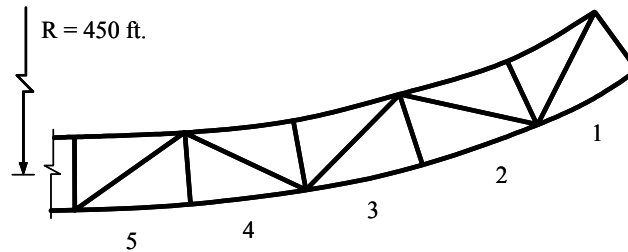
SINGLE-DIAGONAL TRUSS BRACE LAYOUT
